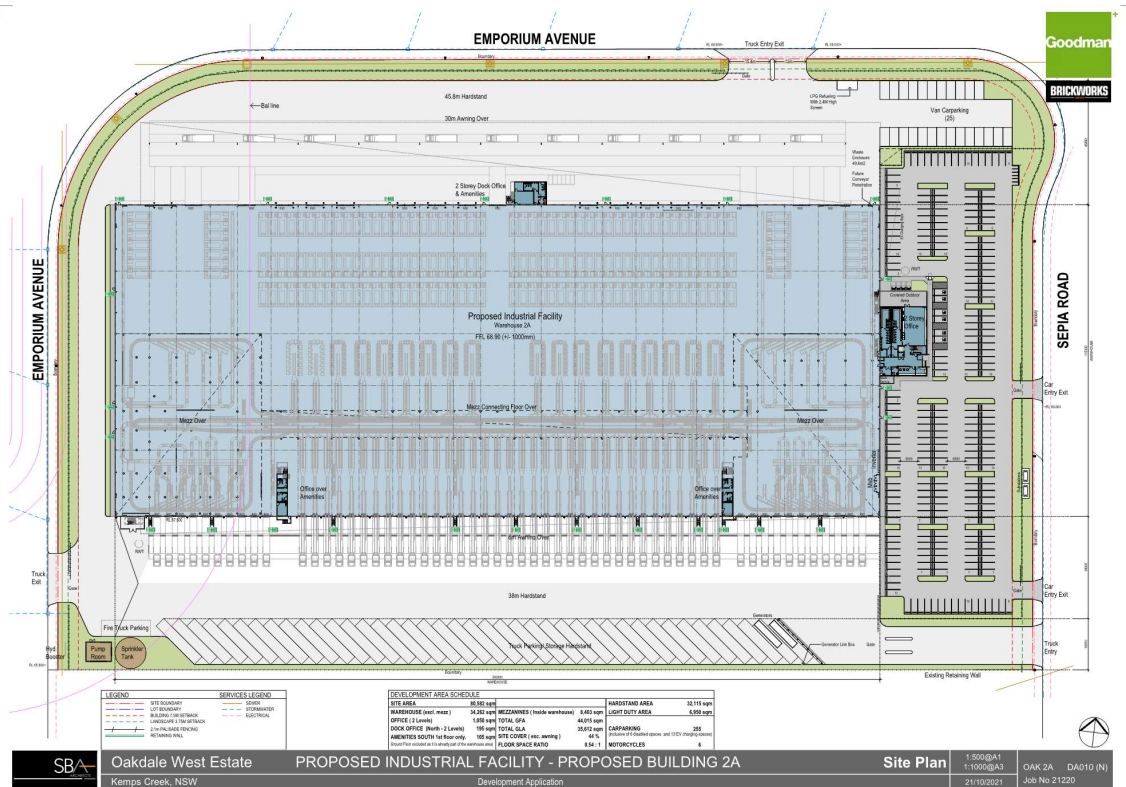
Revised site plan – Building 2A (Source: SBA Architects)
